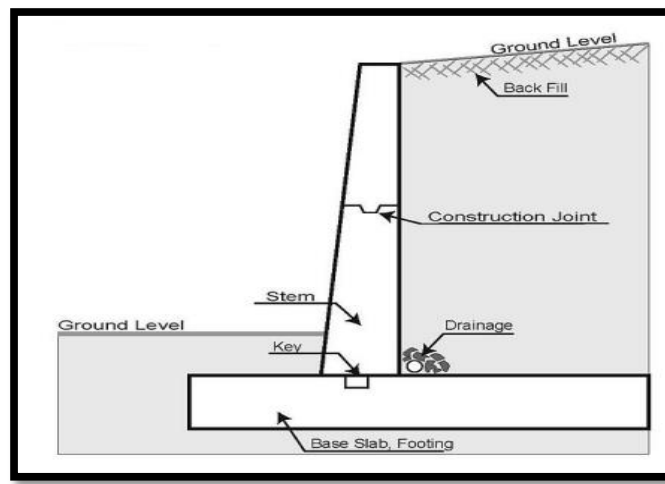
Retaining wall illustration. (<http://www.wikiwand.com/>)
